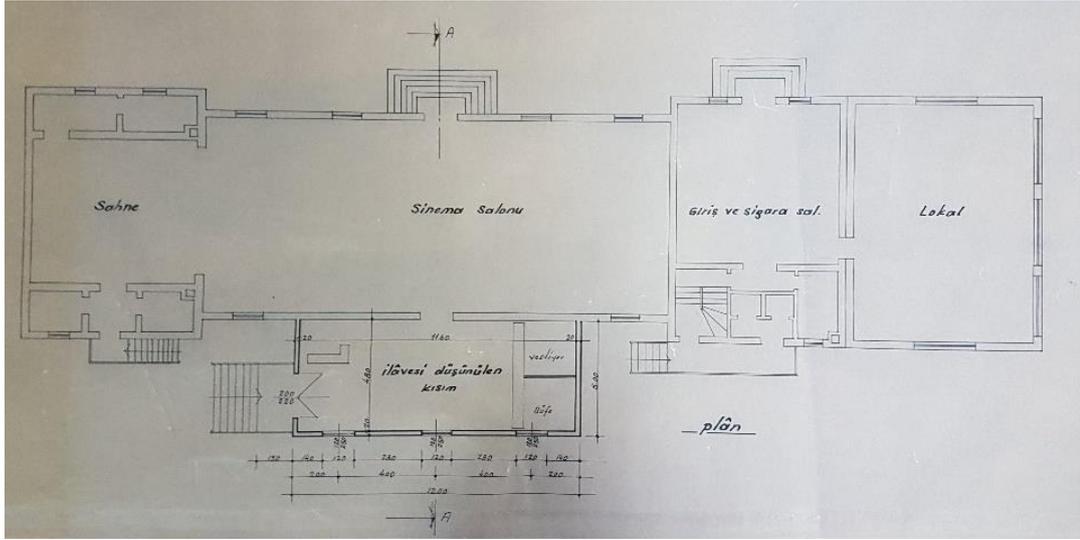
The plan drawing of the extension proposal of the cinema building (Source: TTK Archive, 2020)
